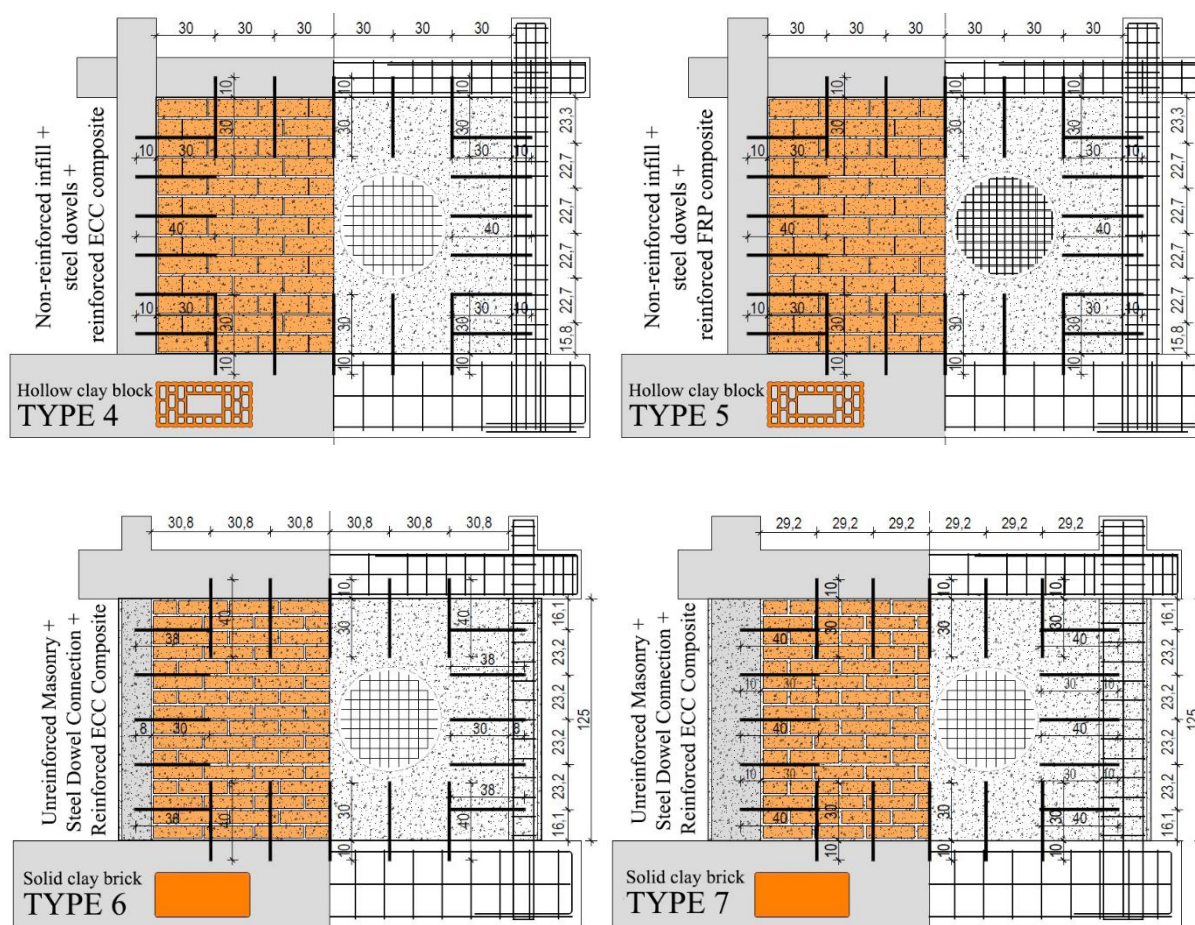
The applied methods of the masonry infill walls. Strengthening methods are shown with and without reinforcement details, i.e., the specimens do not contain any openings.
